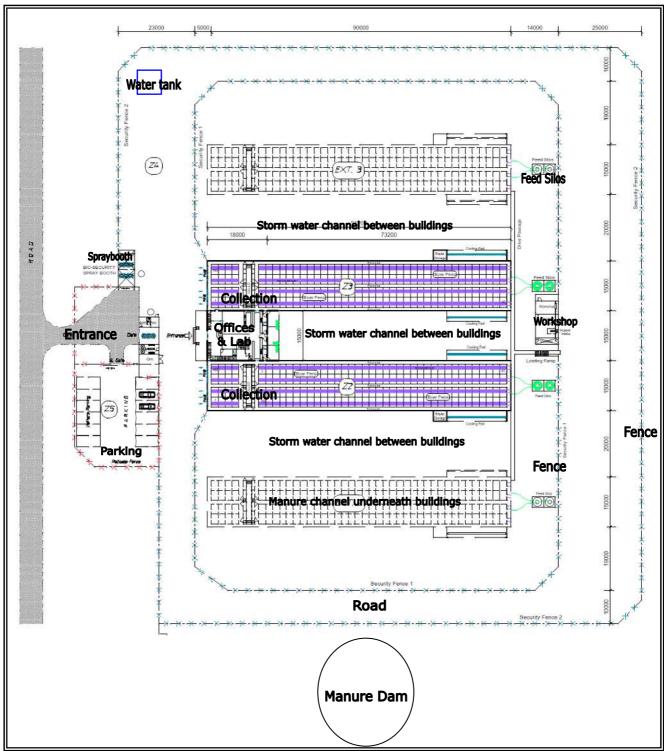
Layout plan of the proposed facility (designed by Dalein Plaasbou, 2017)
